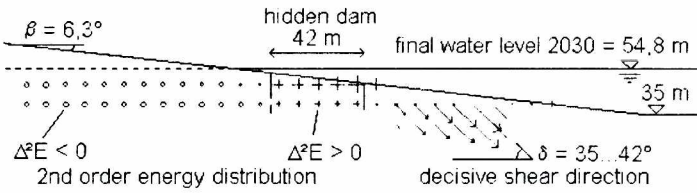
Cross section of the embankment showing the distribution of 2nd order work
